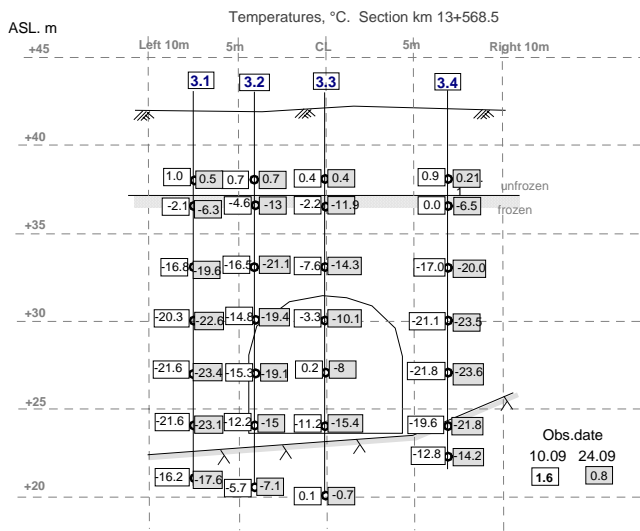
Observations 24.09.2002 and 10.9.2002, Section km 13+568,5.
